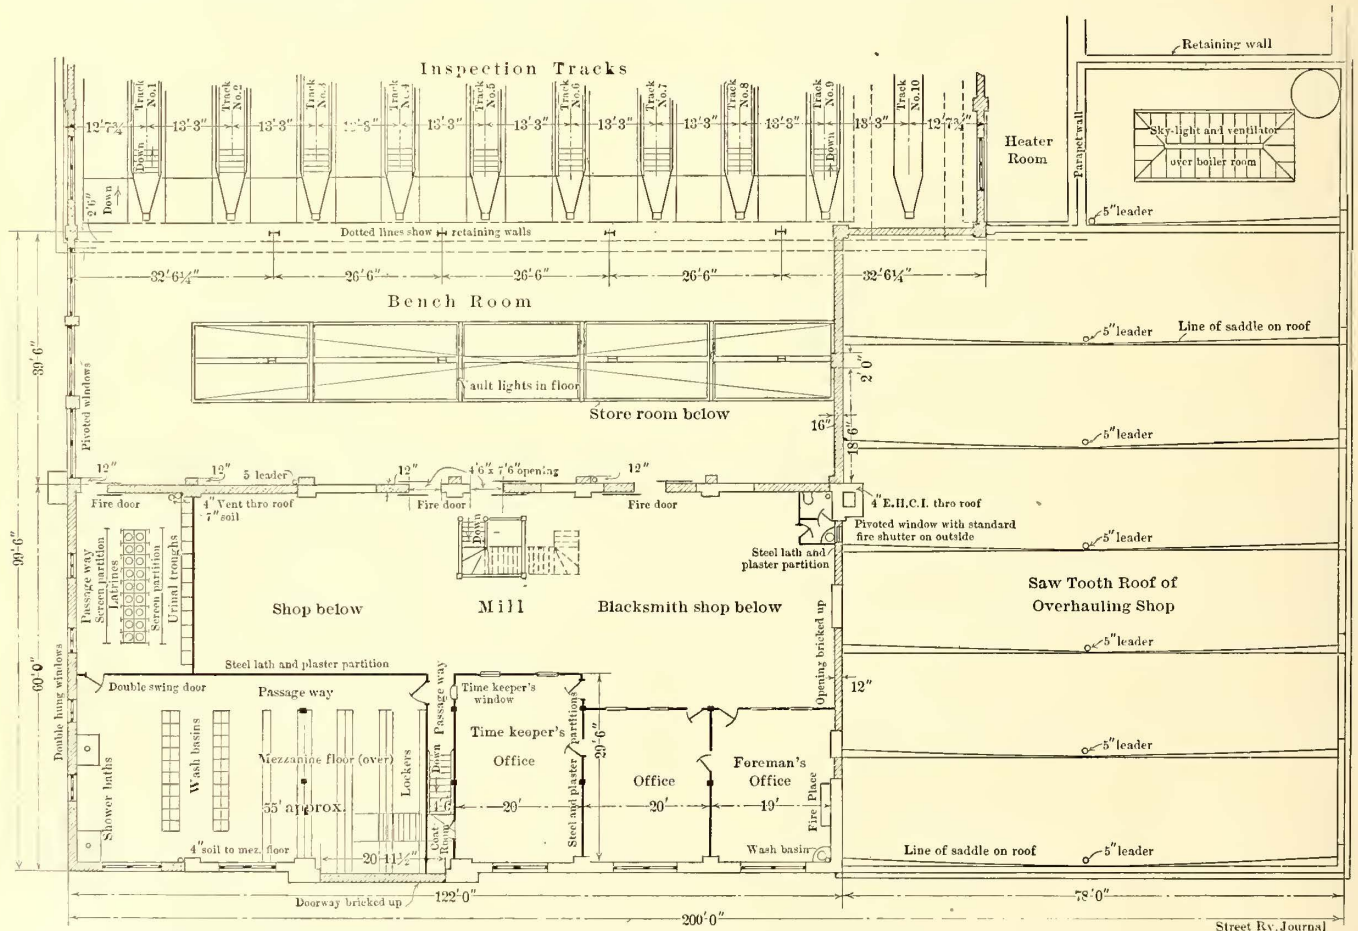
GENERAL PLAN OF TRACK-LEVEL FLOOR, SHOWING ALSO THE ROOF OF OVERHAULING SHOP AND HEATING PLANT
